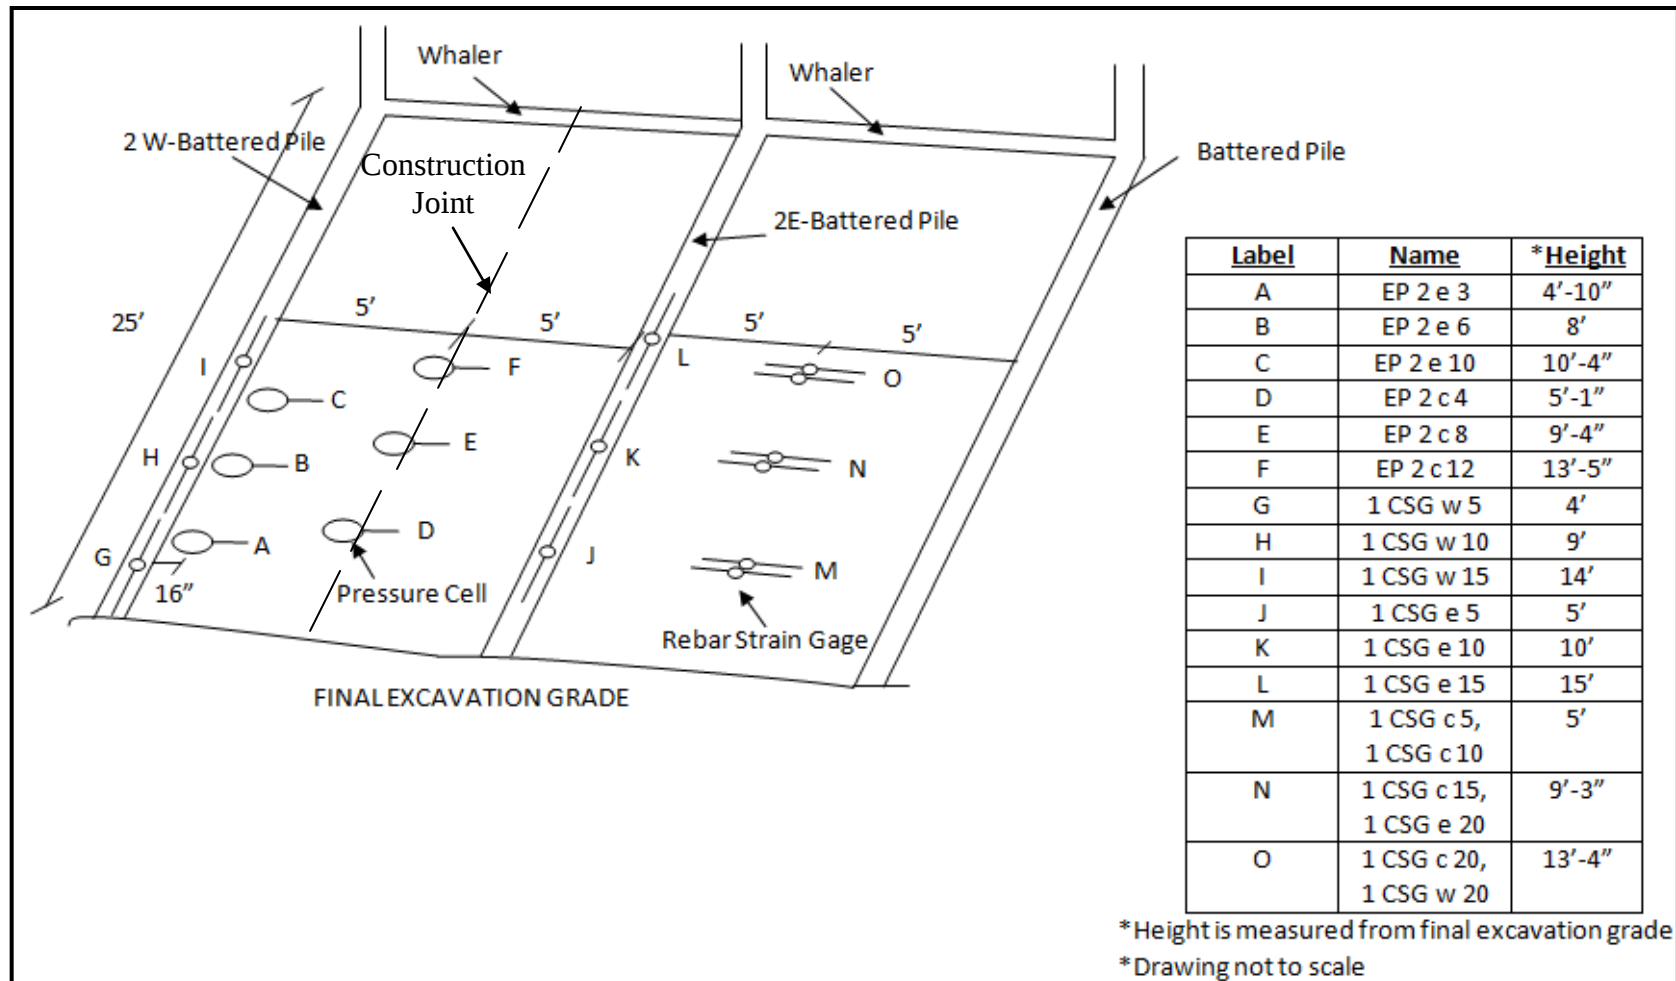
Section 2 Earth Pressure Cell and Rebar Strain Gage Layout
